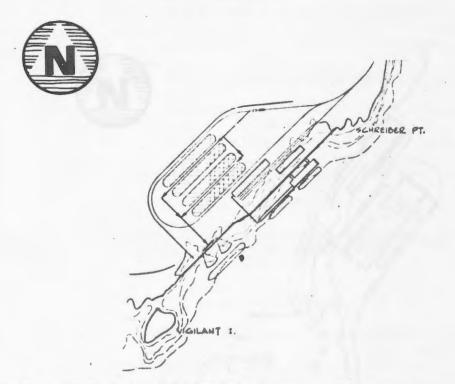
POSSIBLE SITE LAYOUT - BACON COVE
